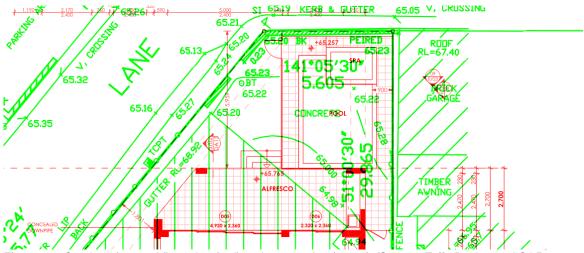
Overlay of ground floor plan (red) and survey plan (green) (Source: Fyffe Design and G&R Surveying Services)
